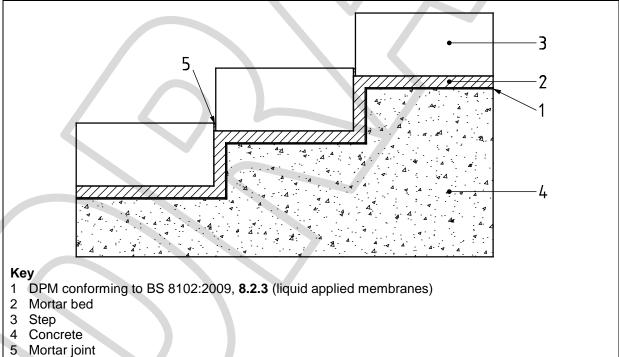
Example of a monolithic step laid onto a profiled concrete foundation (step on step)
